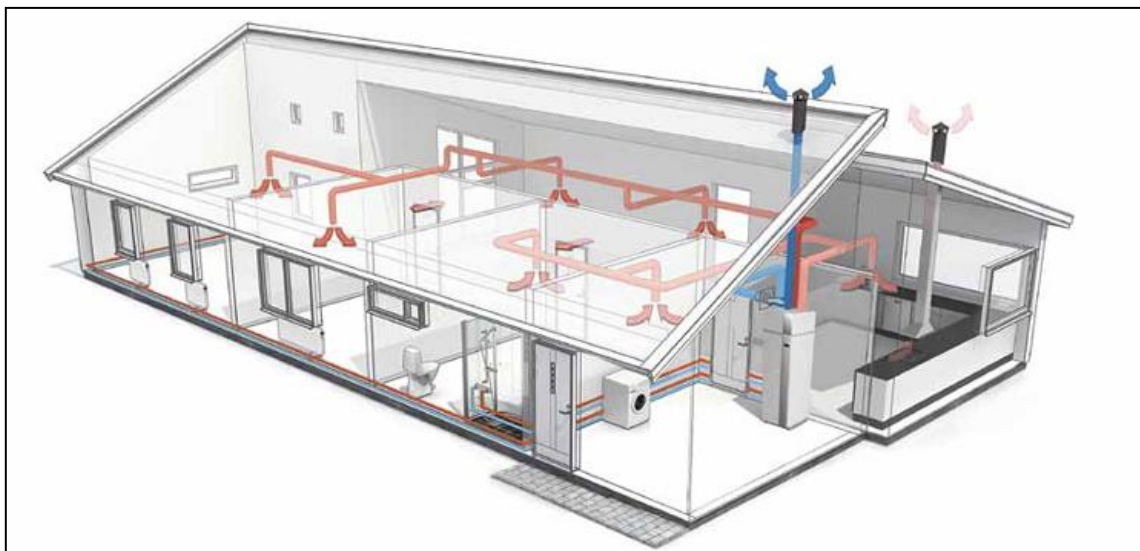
Example Diagram of Typical Exhaust Air Heat Pump Layout
